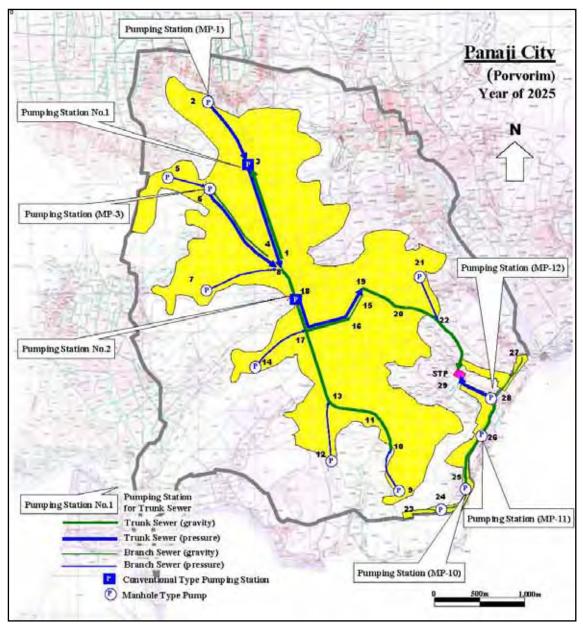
Proposed Sewerage Service Area of Porvorim
